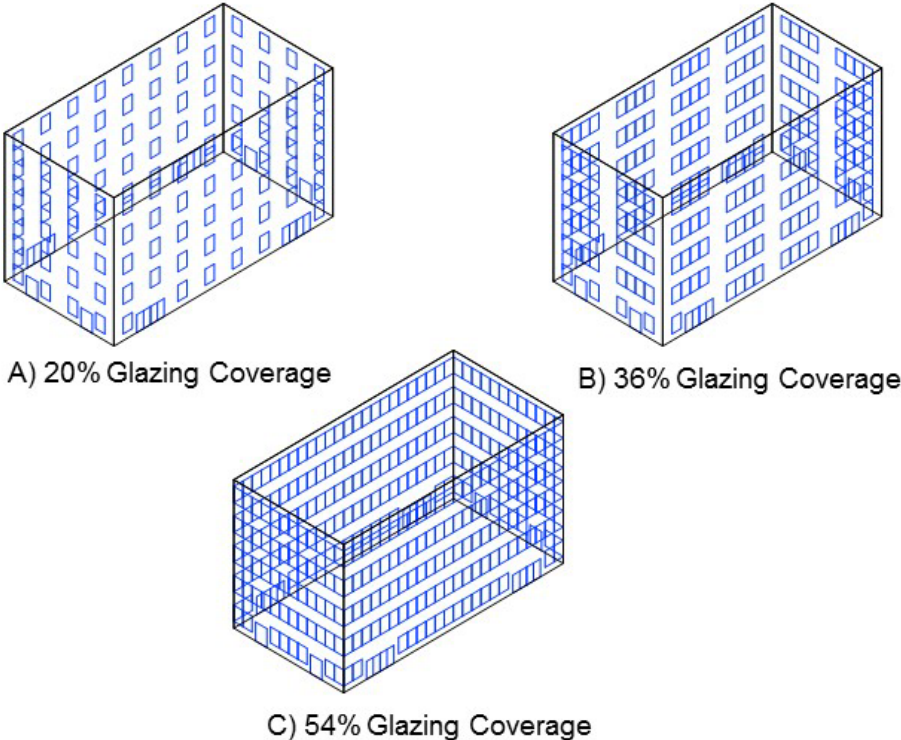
Modeled Five-Story Fully-Engineered Buildings.
